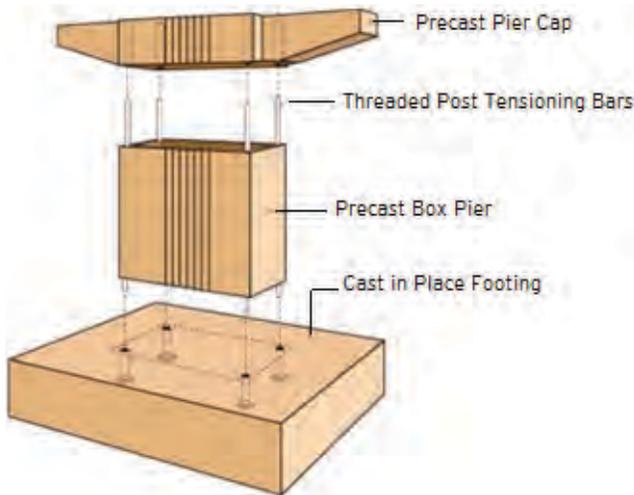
Segmental piers on Route 36 Highlands Bridge.
